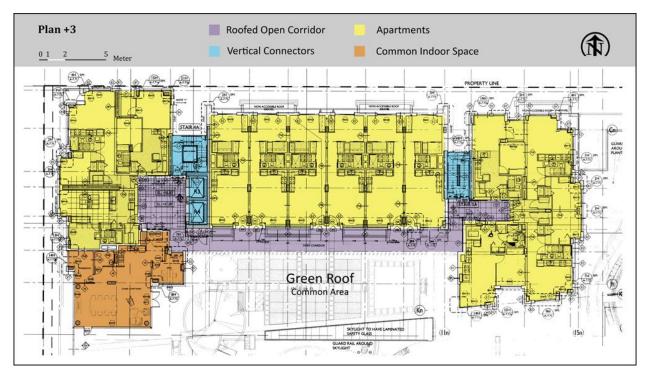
3rd Floor Plan The Arrangement of the open corridor and other areas
